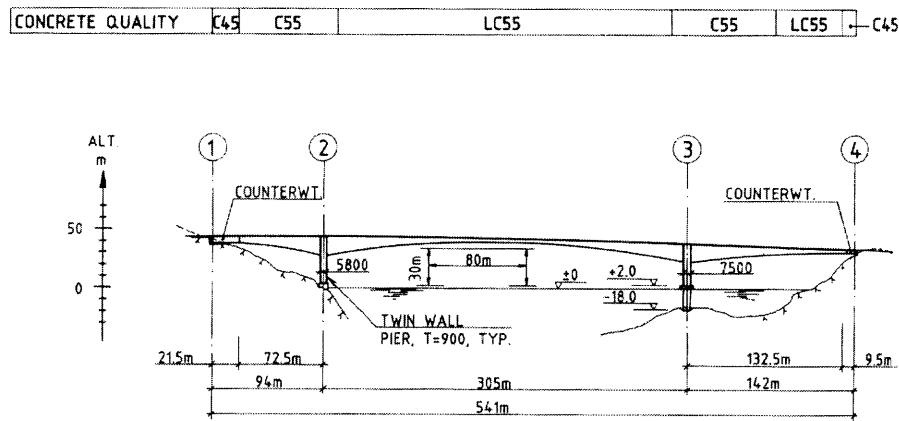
Holandsfjord Bridge, elevation (Gjaever, 1987)
